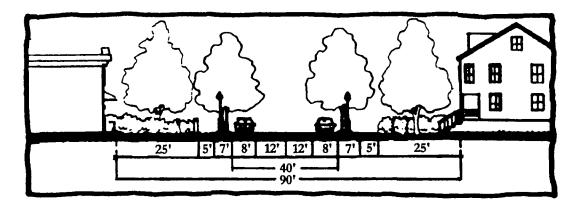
Route 106 Cross section: Commercial/Residential Arterial Two lanes, shoulders, sidewalk and planting strip, and a 25 ft. front yard set-back with no parking
